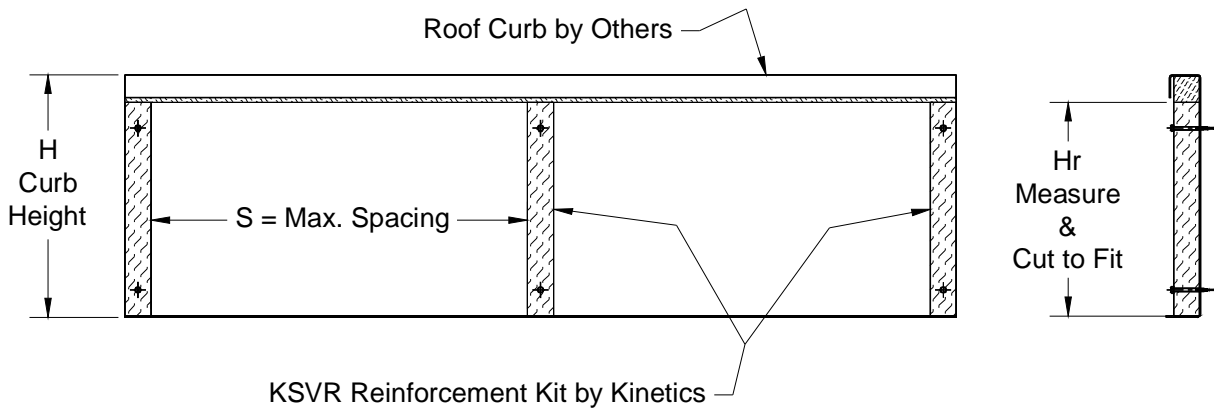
; Typical KSVR Reinforcement Kit Installation.
